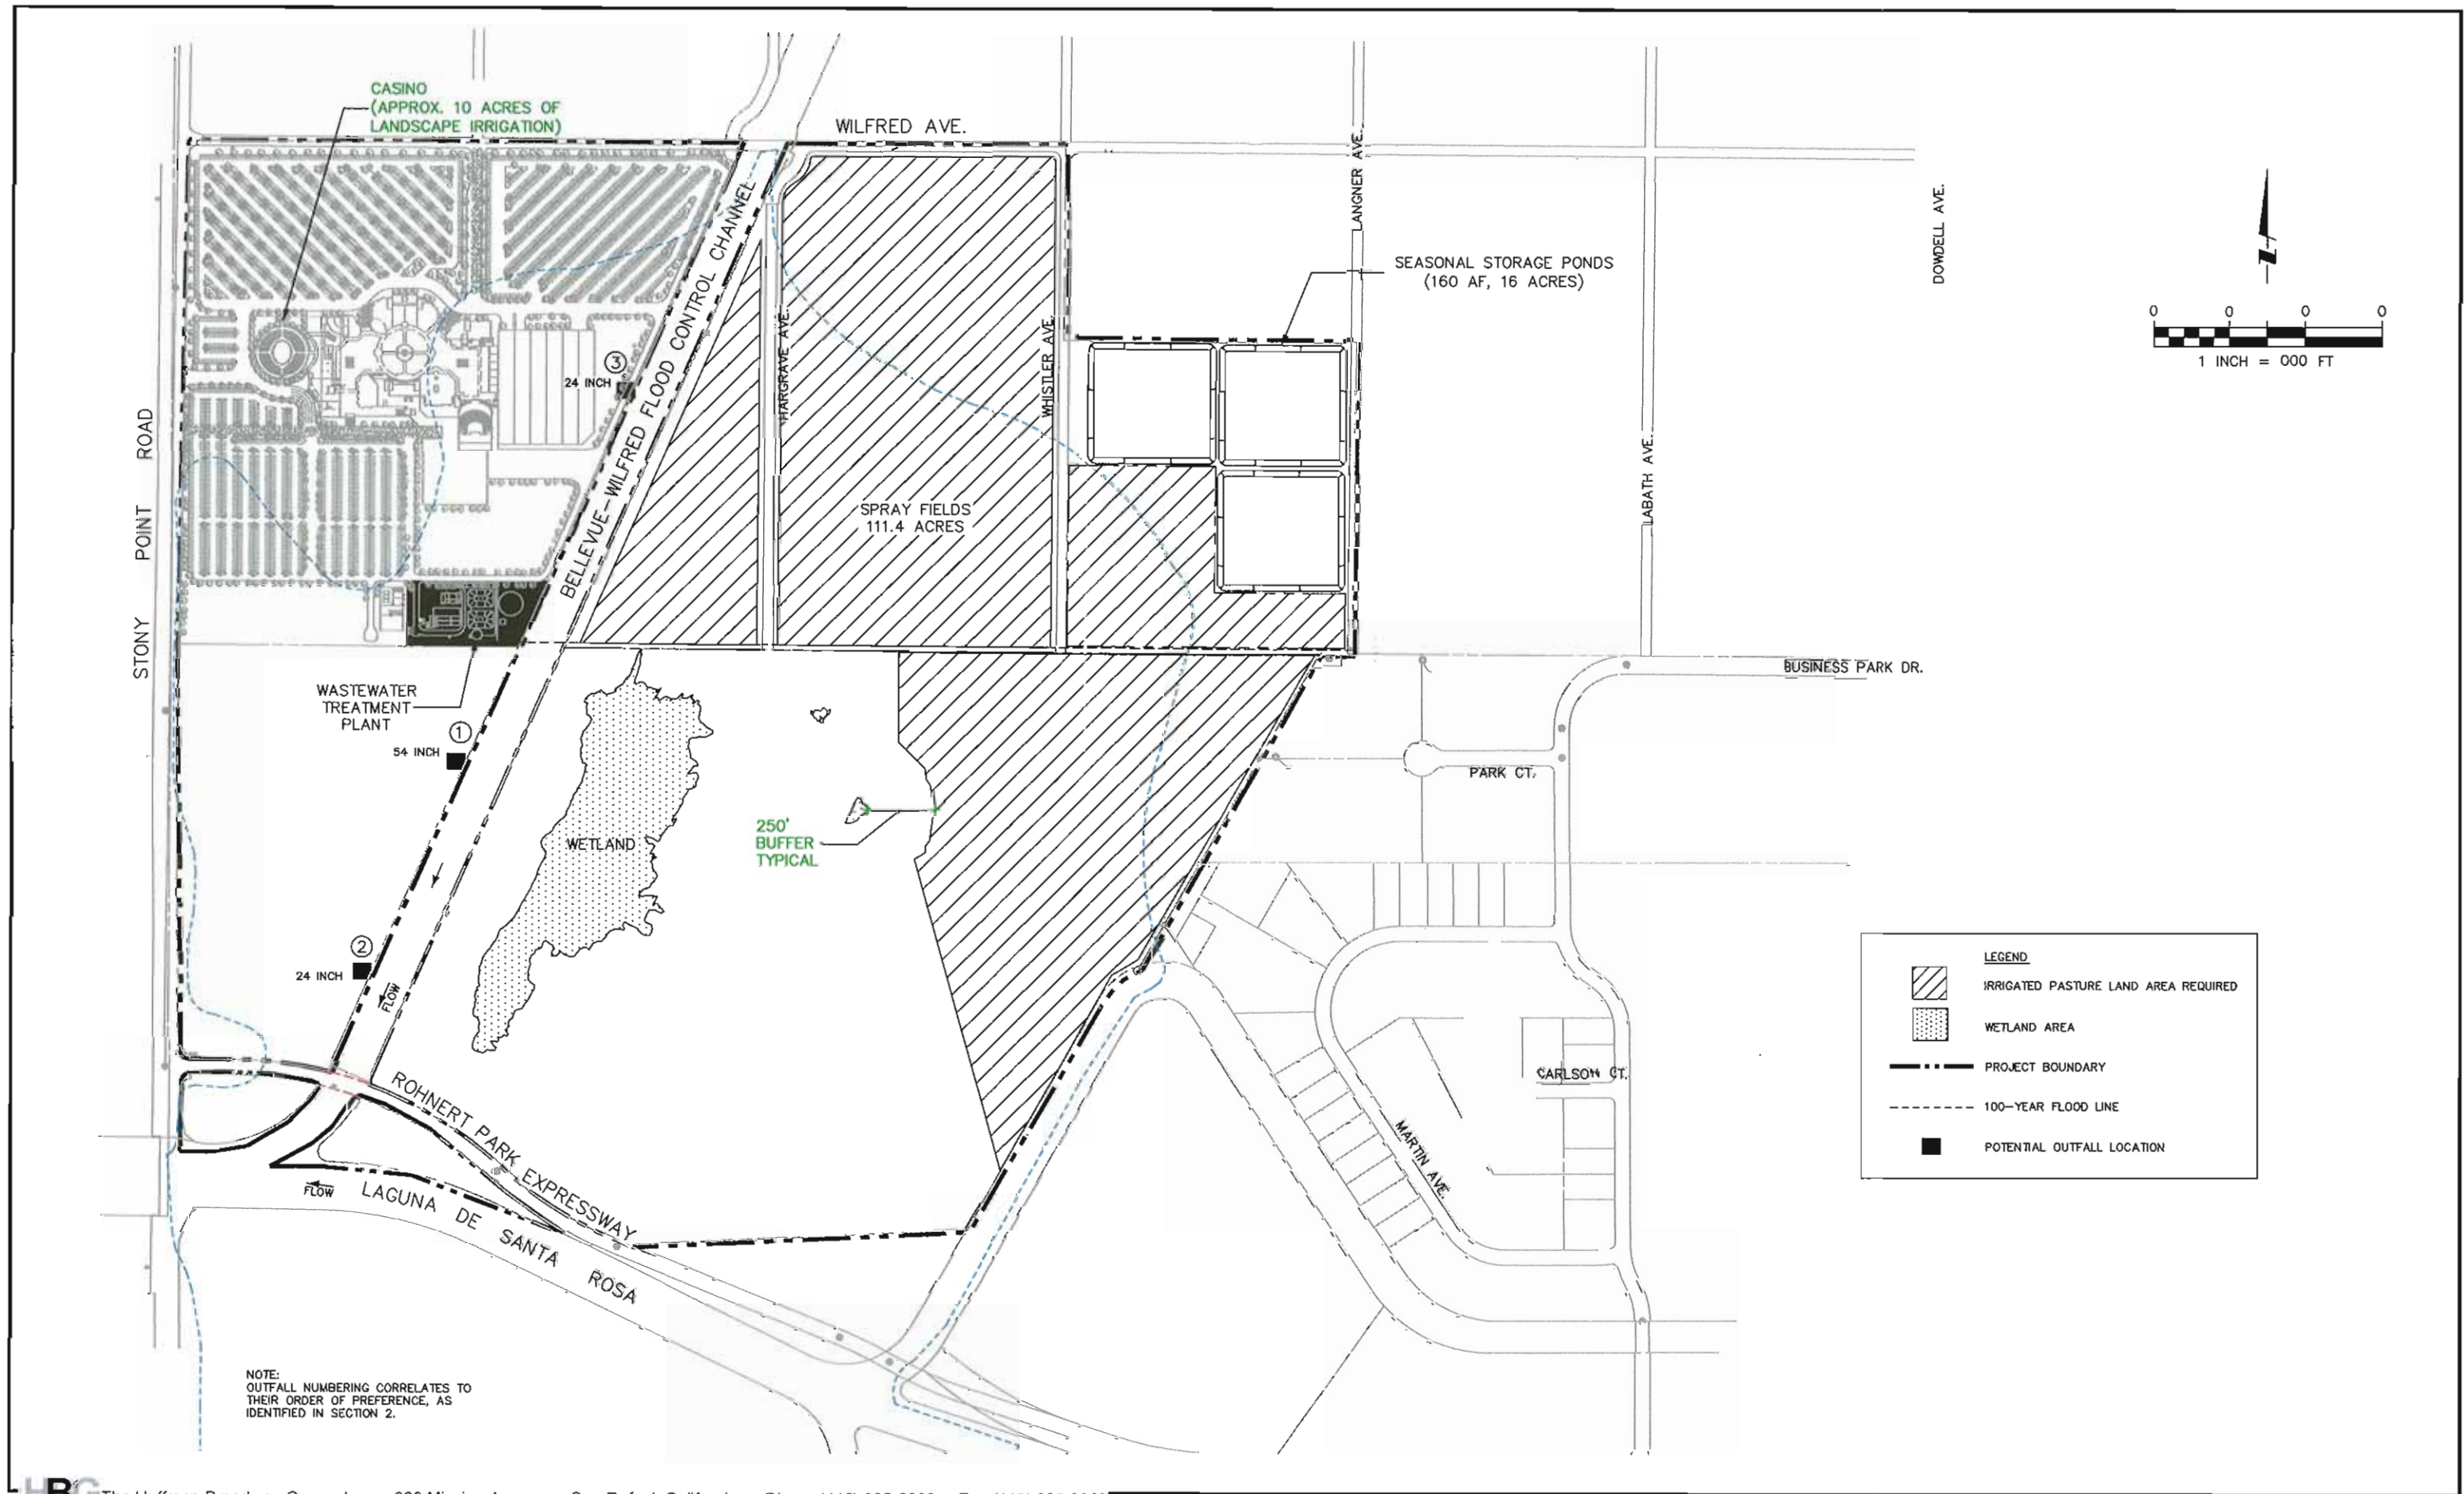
Project Development Plan for Alternative B - Wet Season Storage (Alternative B2)
